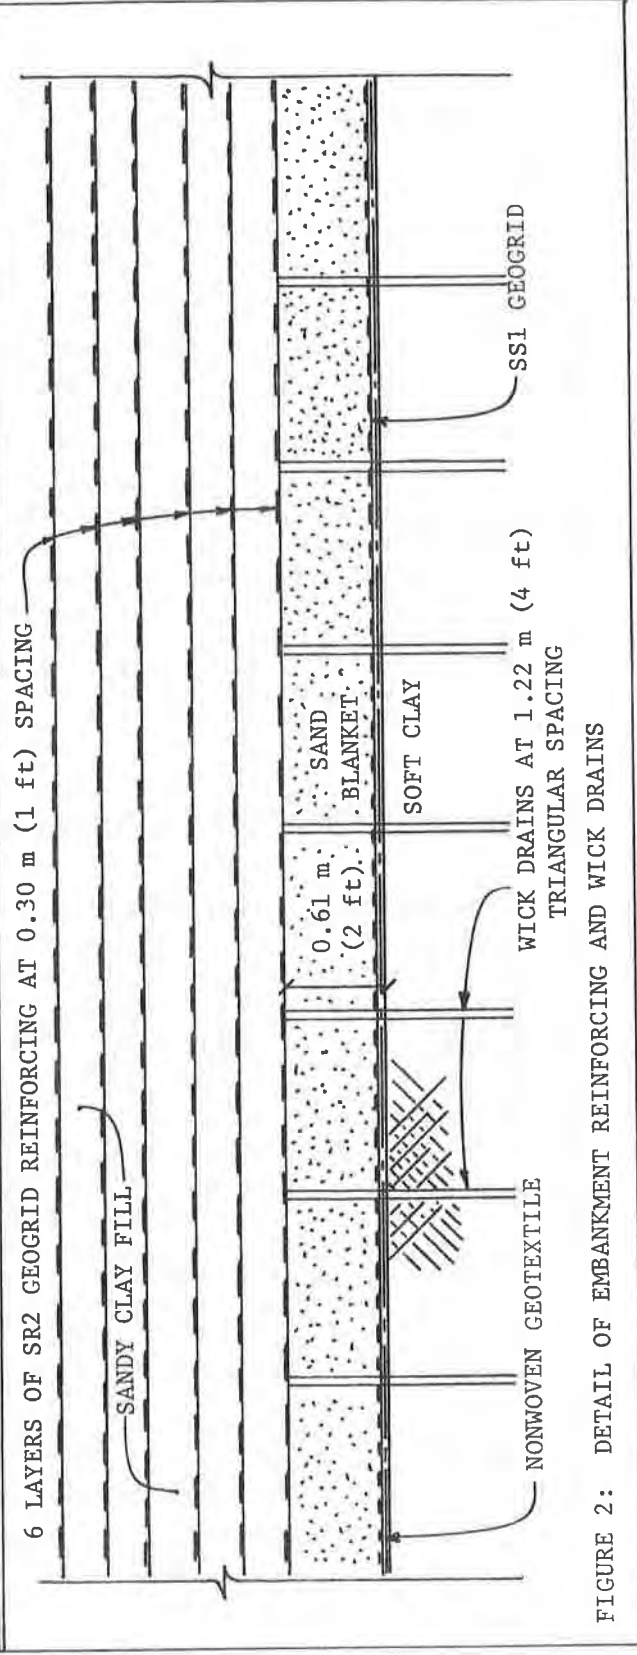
DETAIL OF EMBANKMENT REINFORCING AND WICK DRAINS
